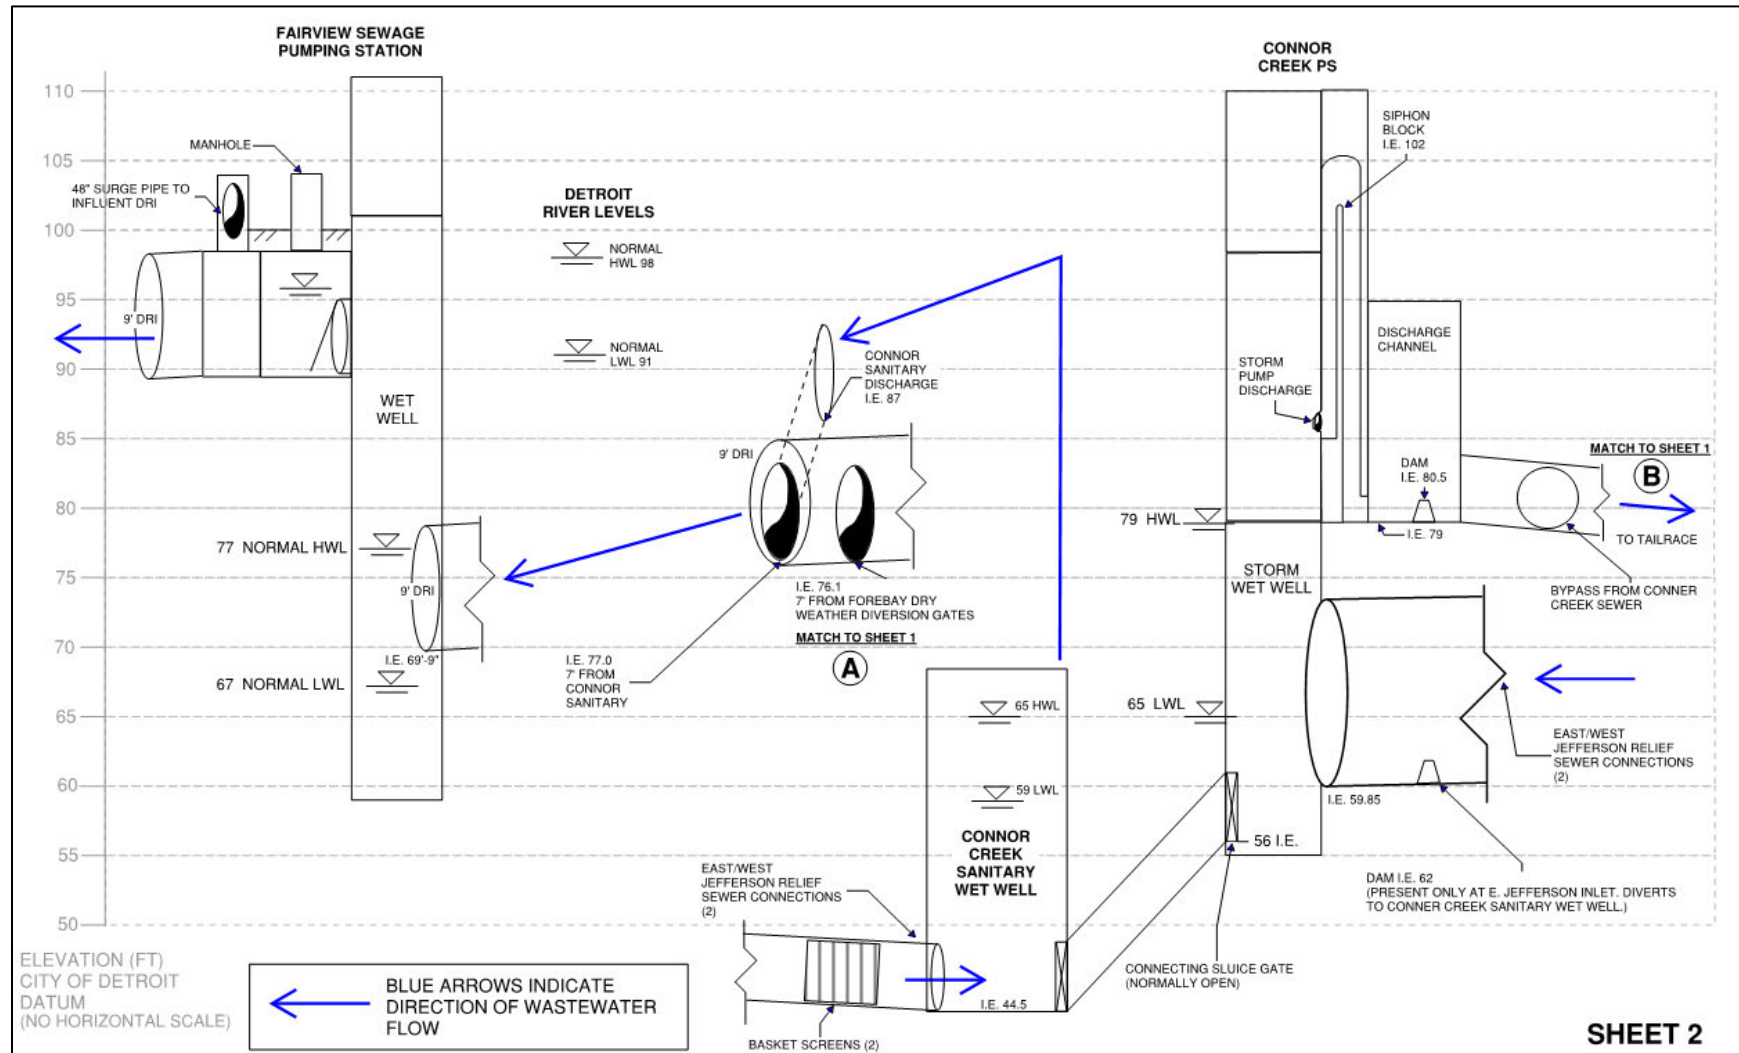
B. Collection System Profile, Sheet 2 of 2
